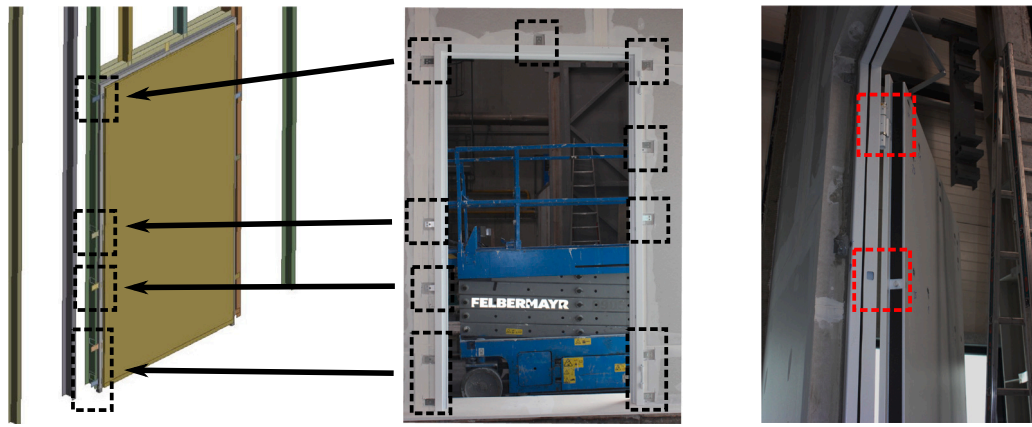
Fixed connections between the door's frame and the wall as well as the door leaf and the door's frame.
